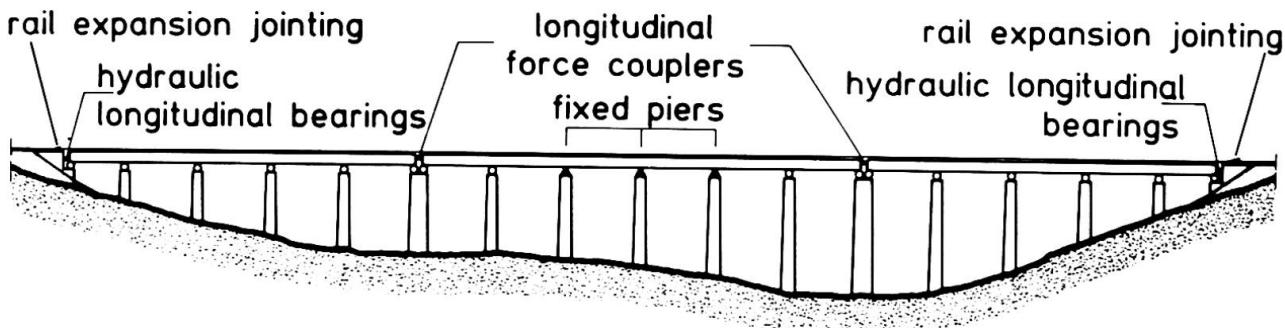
Continuous girder bridge with hydraulic longitudinal bearings
